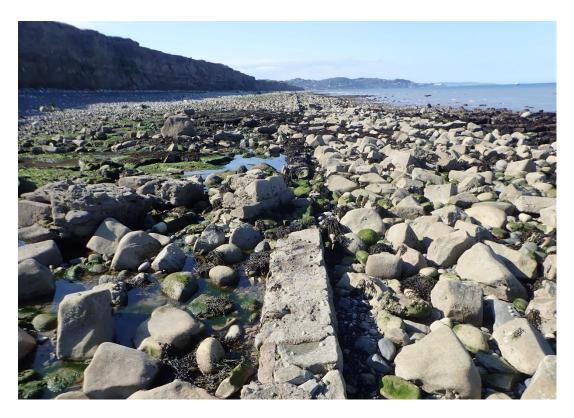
View looking north at base of retaining wall. Position of image indicated on Figure 4.
